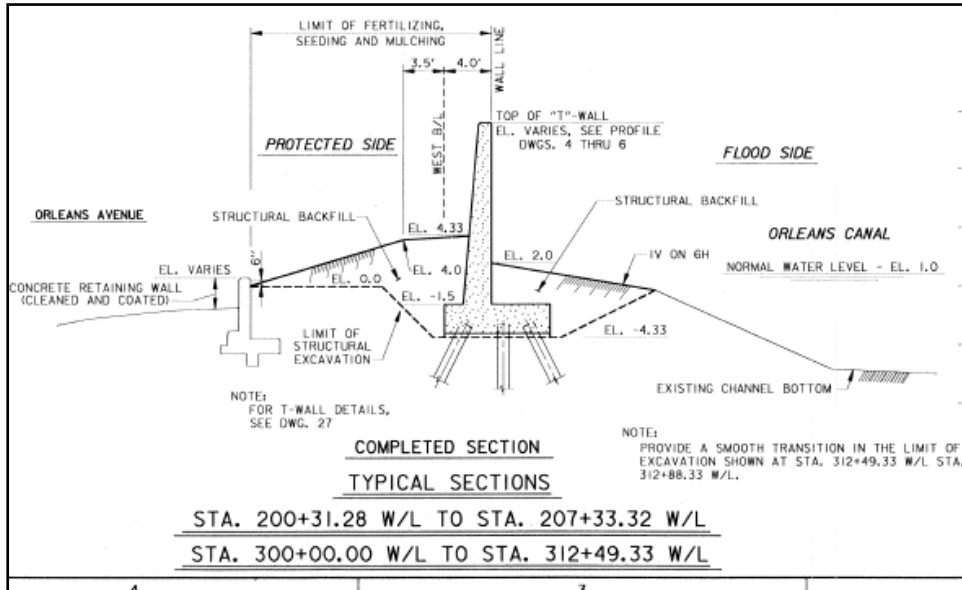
“Normal Water Surface” Notation on Flood Side of Orleans Outfall Canal (Typical)
